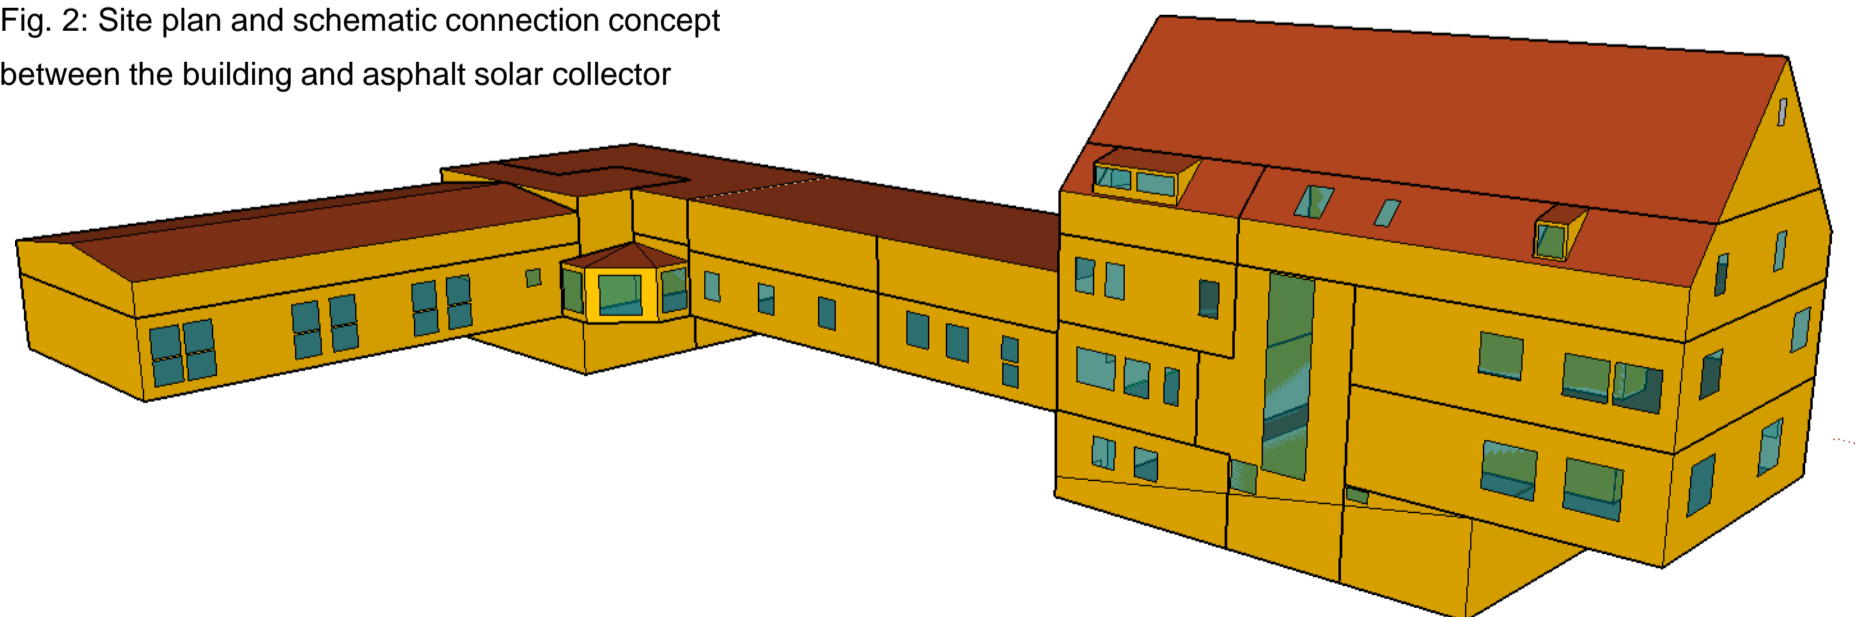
Sketch-up model of the building connected to the asphalt solar collector
